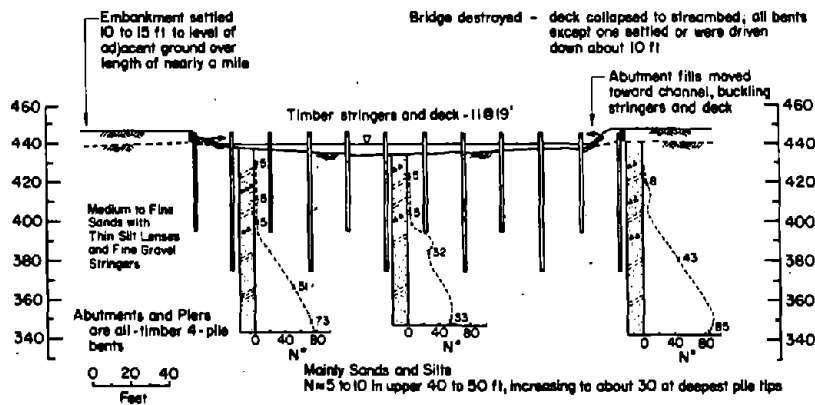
Bridge 605: Snow River (centerline section looking downstream - natural scale).
